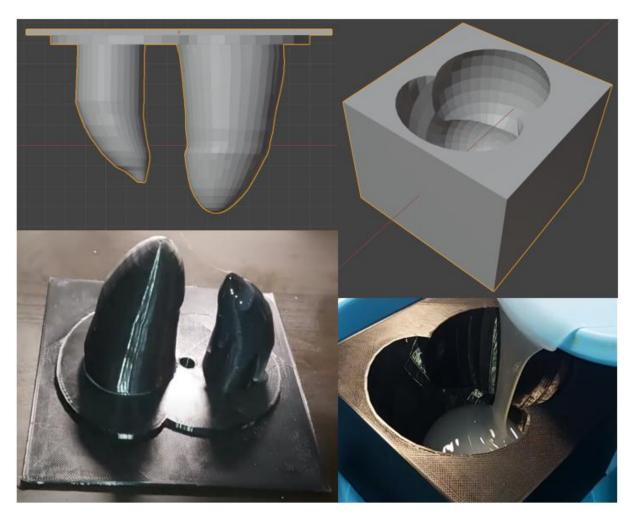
The upper two pictures show our designs of the inner (top left) and outer (top right) form, between which the tube system and silicone will be. These were created with Blender 2.92. The lower two pictures show the 3D printed inner (bottom left) and outer (bottom right) form, being coated (left) and filled (right) with silicone.
